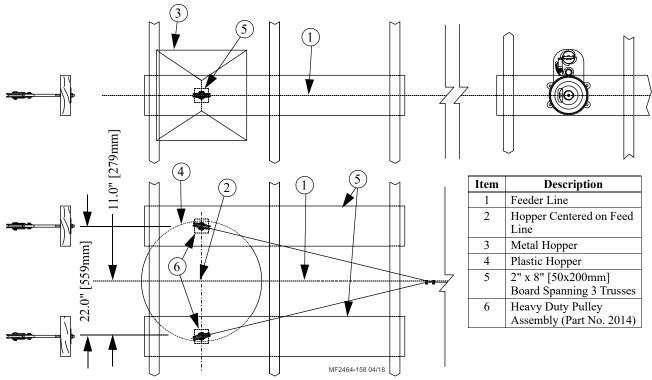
Cable Installations at Hopper Locations (Wood Construction)
